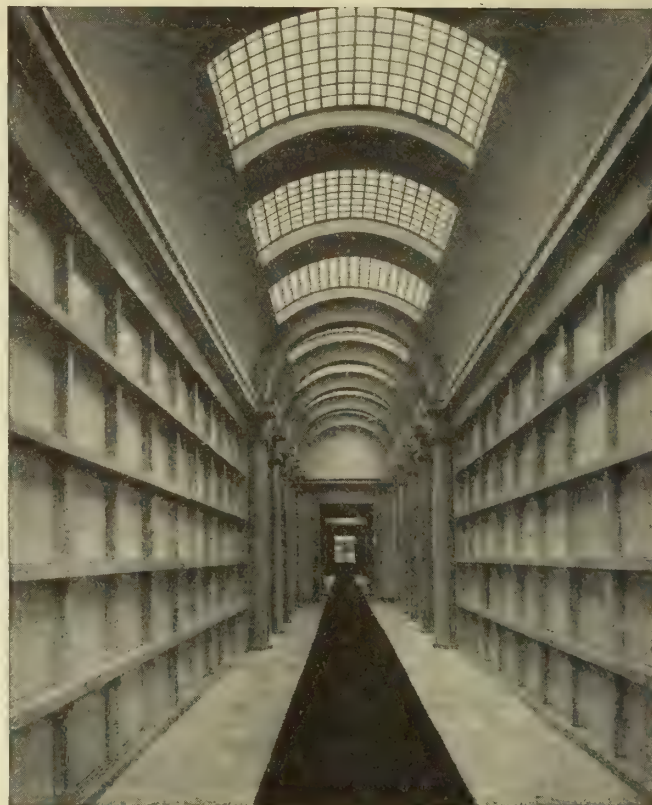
"BRUNER" FLOOR LIGHT CONSTRUCTION
